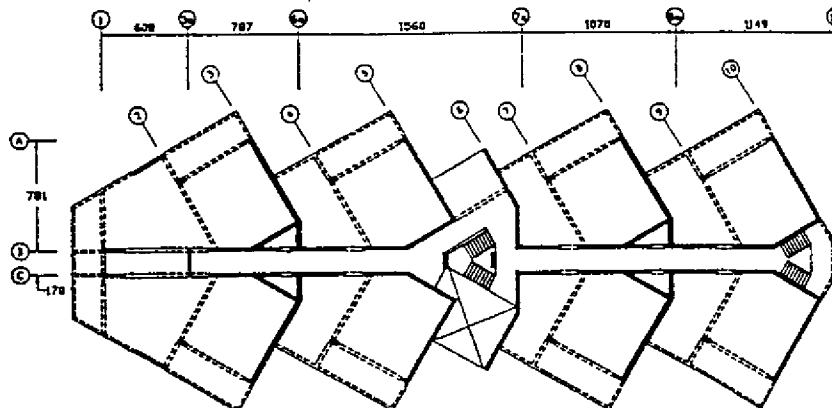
TYPICAL FLOOR PLAN OF A 23-STORY RC BUILDING IN VIÑA DEL MAR (UCB/EERC-89/05, Wallace and Moehle, 1989)
